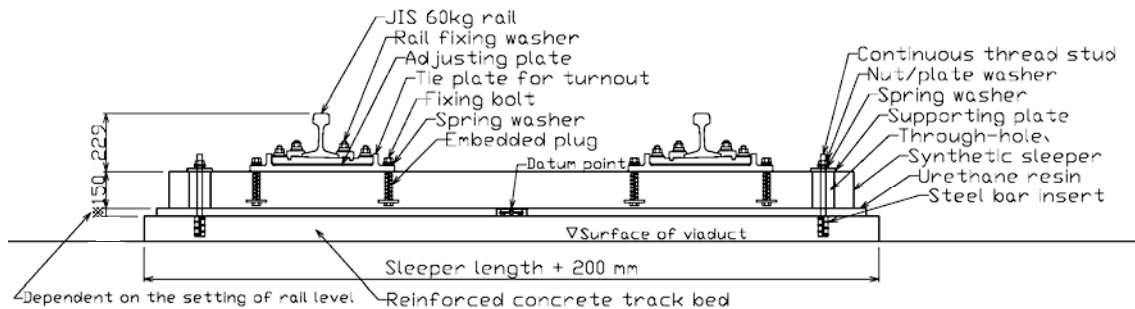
Standard Cross-section of the Track Structures at Turnouts in Viaduct/Bridge sections.
